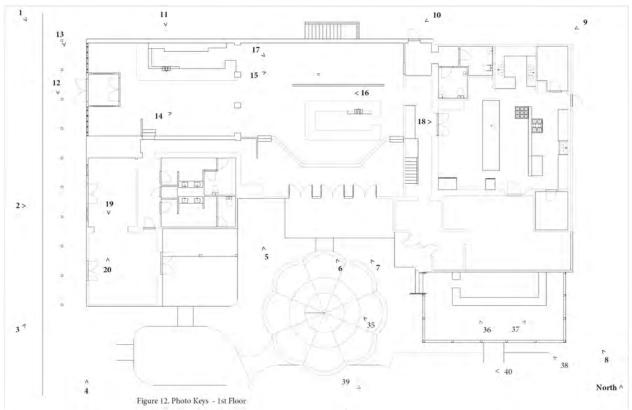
Photo Keys - 1st Floor. 51 Current floorplans.
